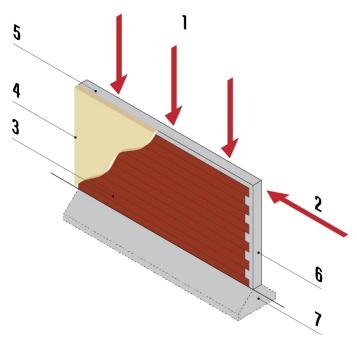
A wall is strong for downwards forces (1) and horizontal forces (from earthquakes) (2) parallel to its length. Masonry units or bricks (3) are plastered (4) and supported by a foundation (7). The masonry is confined by a tie beam (5) and practical or tie columns (6).
